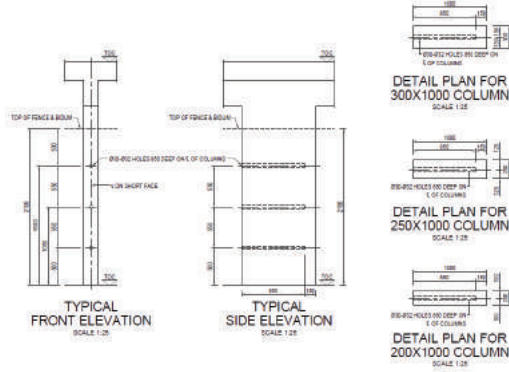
Drilling Details of 5th, 11th, and 16th Floor Columns
